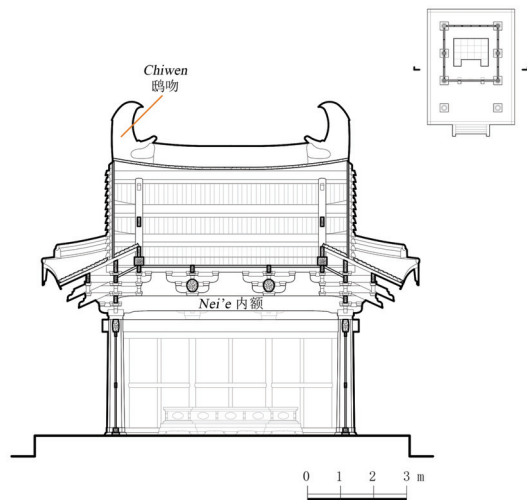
Longitudinal section of the main hall reconstruction. Drawing by authors.
